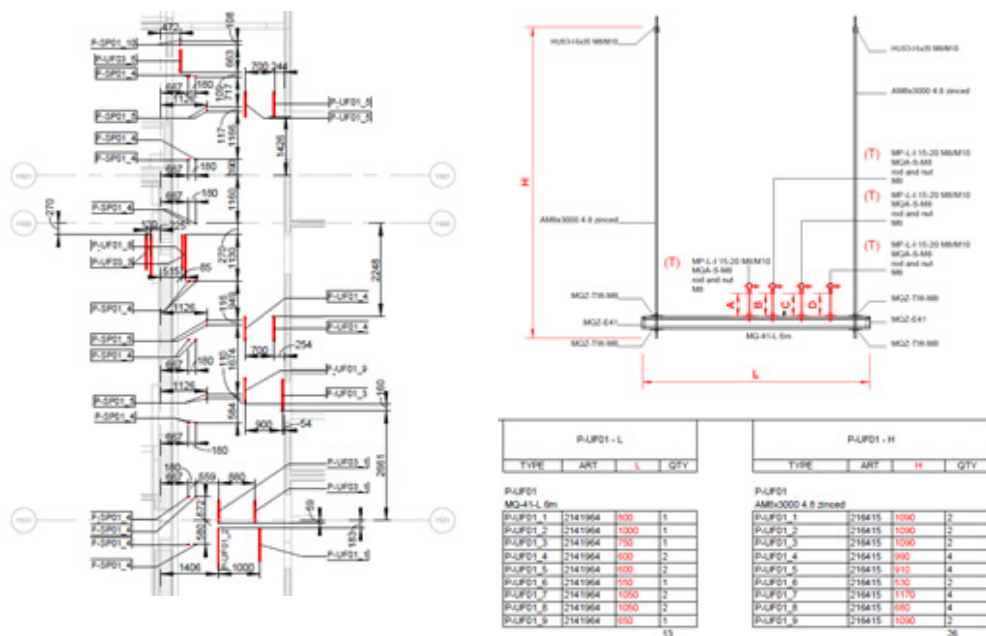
Example of drawings generated: plan view (left), section view (top right) and table with parameters (bottom right).
